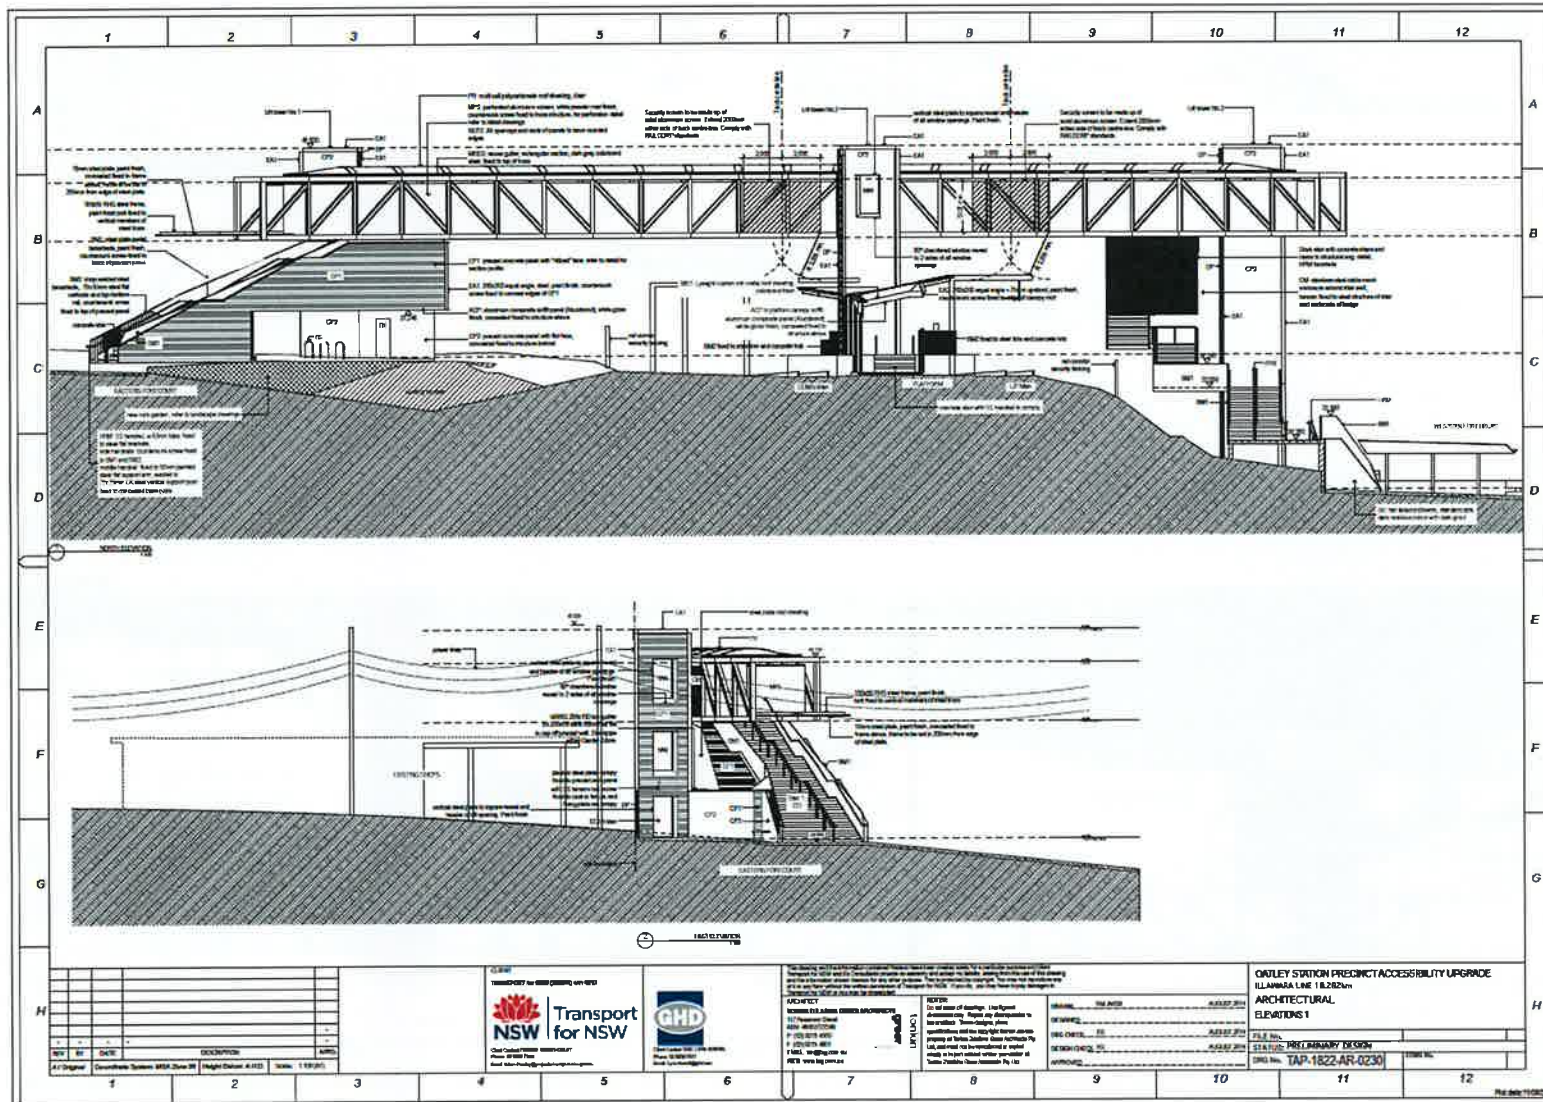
Proposed elevations of Oatley Station, looking through the platform to the east and north, showing existing and proposed elements.
